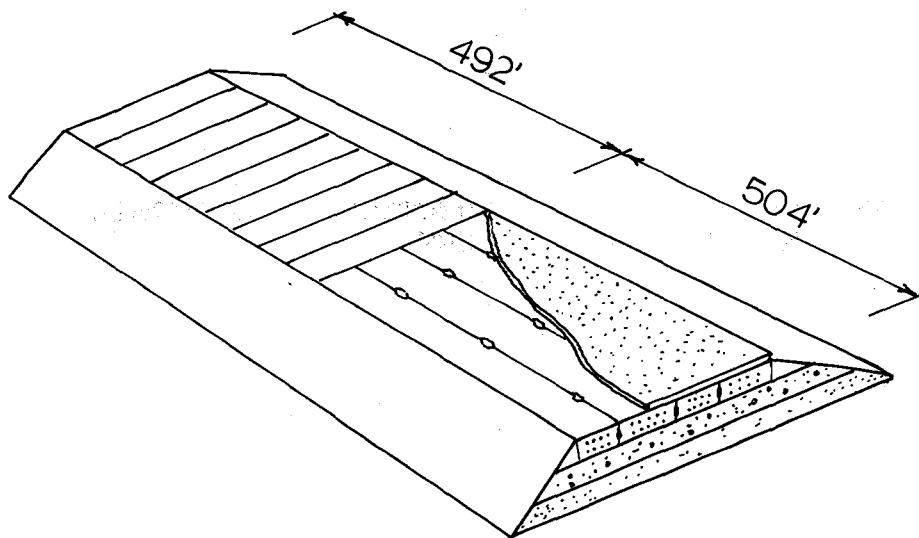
ISOMETRIC VIEW OF SOUTH DAKOTA PROJECT TEST SECTION
